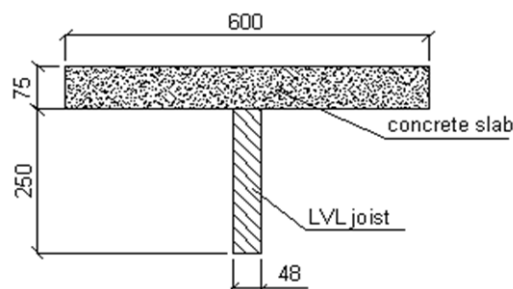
Cross-section of the TCC beam (Typical) (measured in mm)
